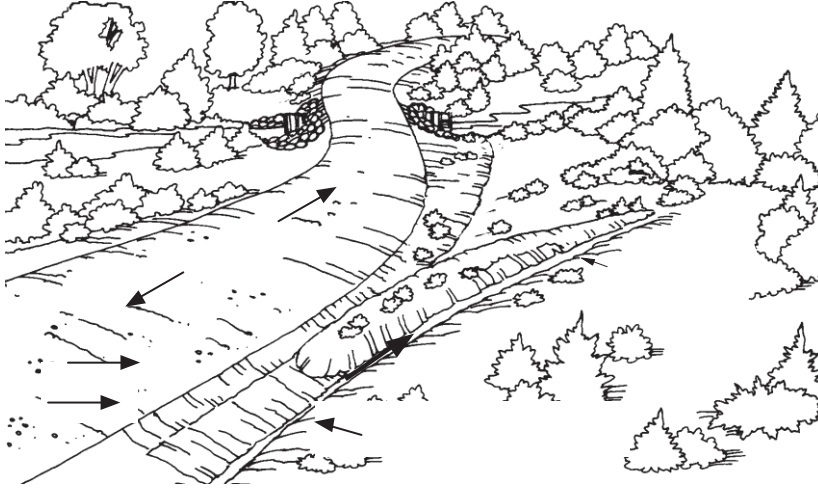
Setting a gravel and sand filter in the foot of the embankment in which the road was formed.
